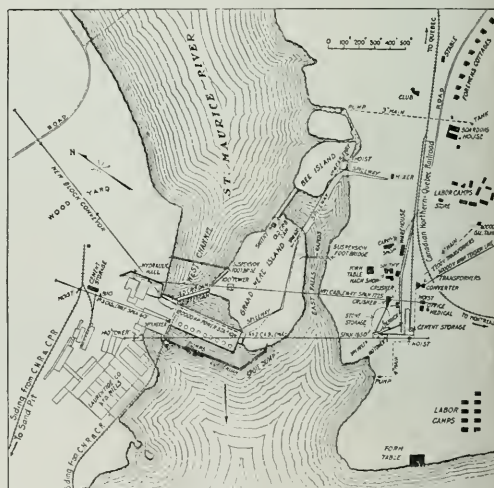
Contractor's Construction Camp, and Layout of Present and Proposed Development at Grand Mere.
